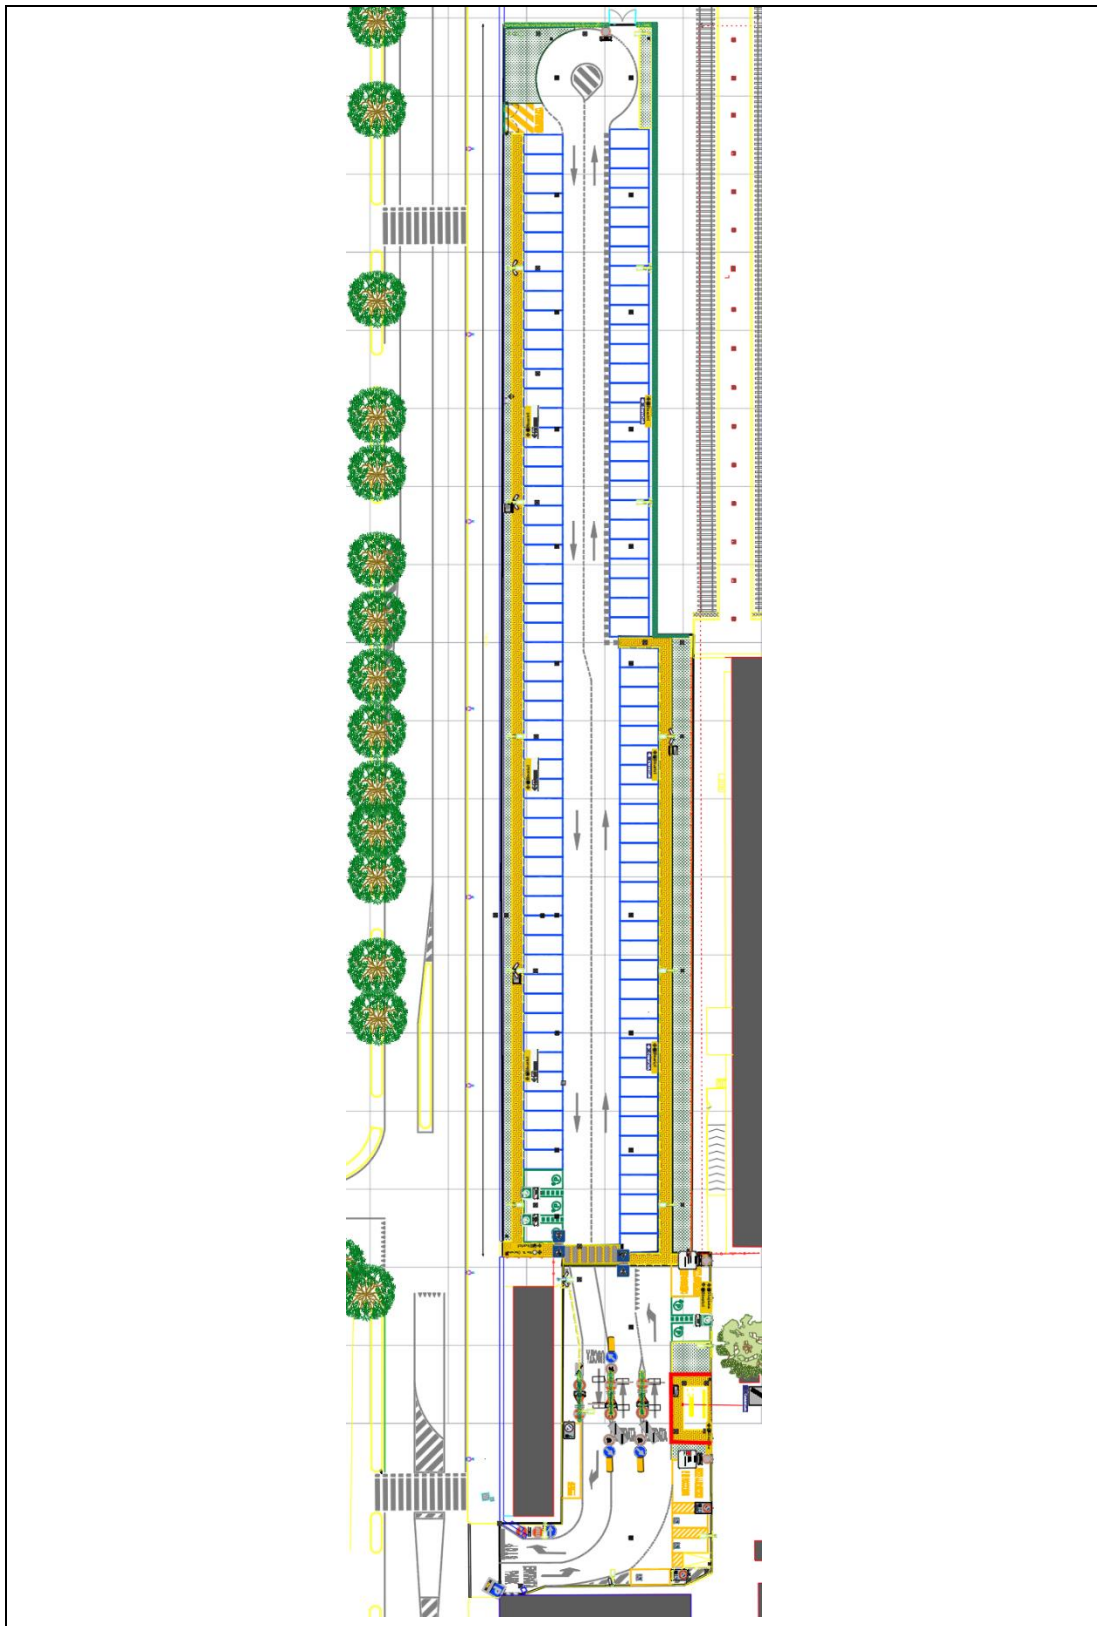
Planimetry of the executive project of Ferrara parking area.
